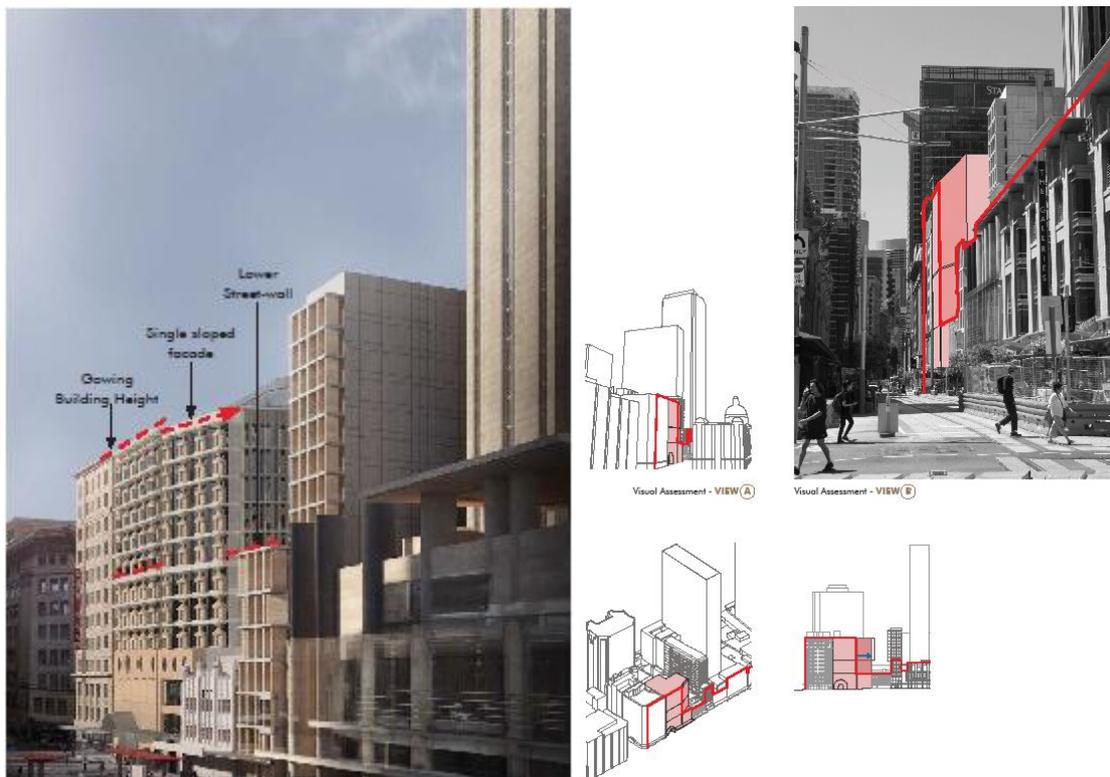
Extract from 'Facade Design Development Report (Candalepas Associates), illustrating the street wall height analysis associated with the final architectural design option for the site
